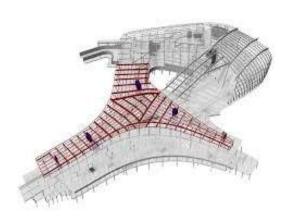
QFIS Structural system Roof Steelwork – Library Area -source: Constantine Emmanouil Migiakis P3
